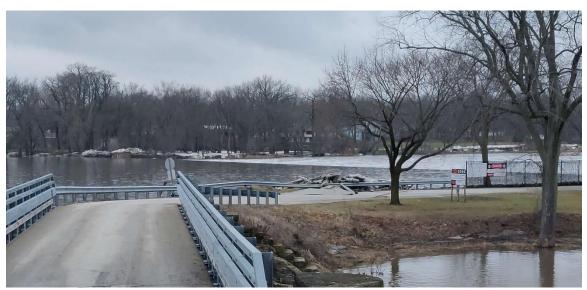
Damage to the roadway through Island Park in Wilmington. Note the piles of ice and shear walls on the opposite river bank still visible on January 30.
